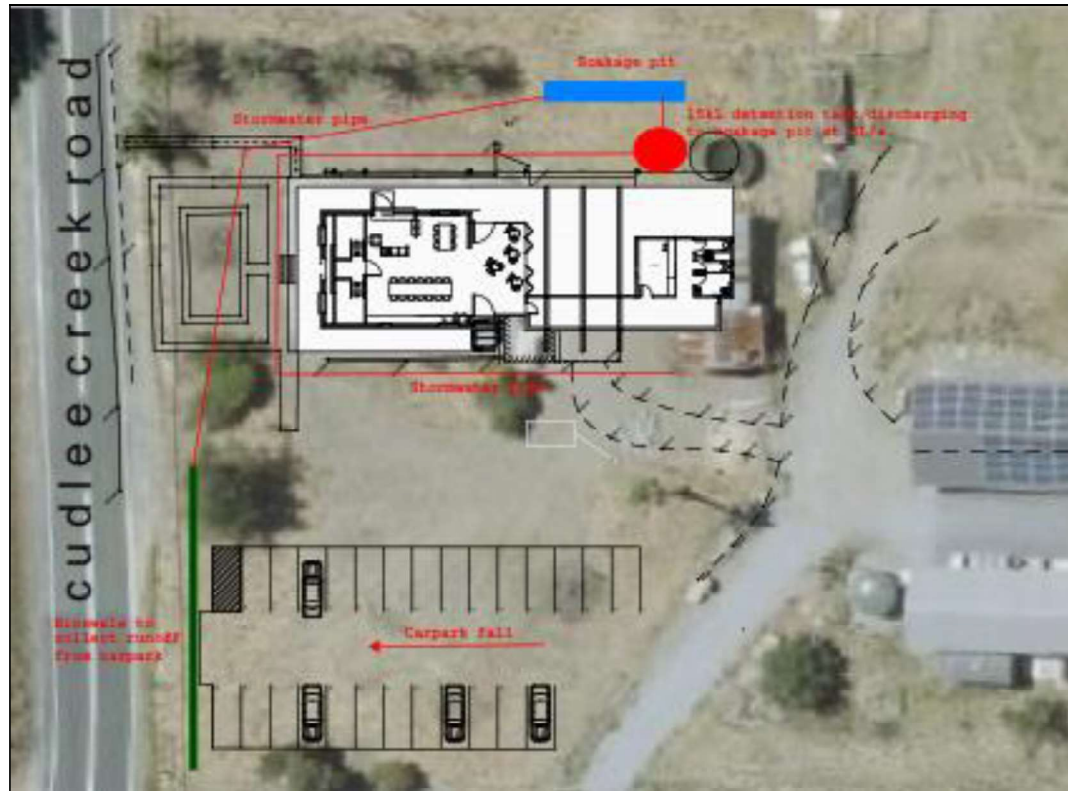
| Stormwater Management Plan (Source: PT Design SWMP, 2021)
